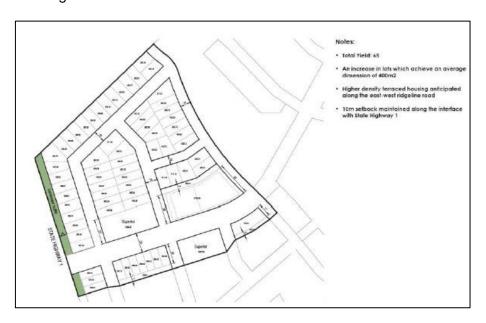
338 Rodney Street - Stage 1 Scheme Plan
